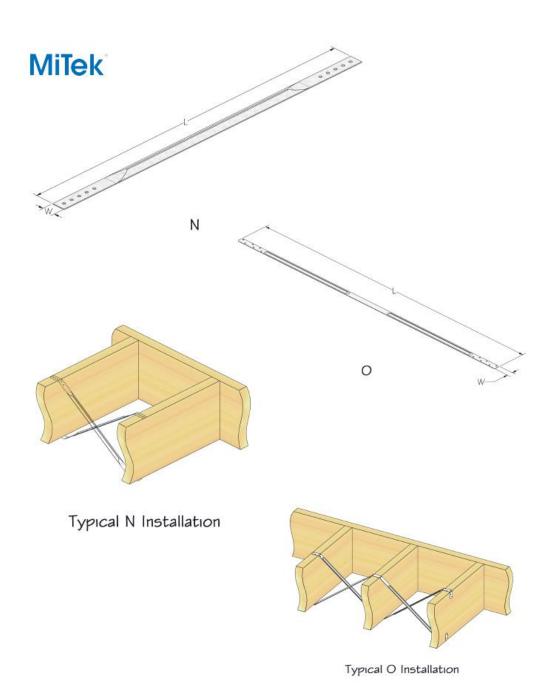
N AND O SERIES BRIDGING DIMENSIONS AND TYPICAL INSTALLATION DETAILS
